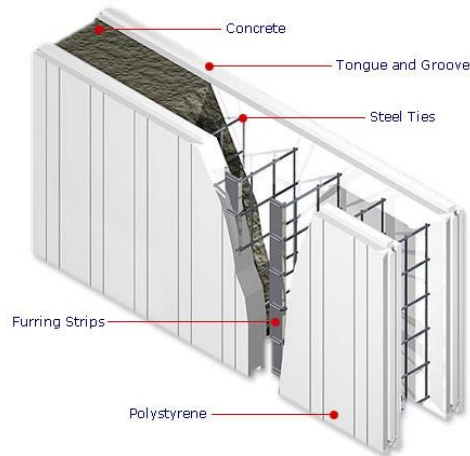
Example of insulating concrete formwork. Extracted from [57]
